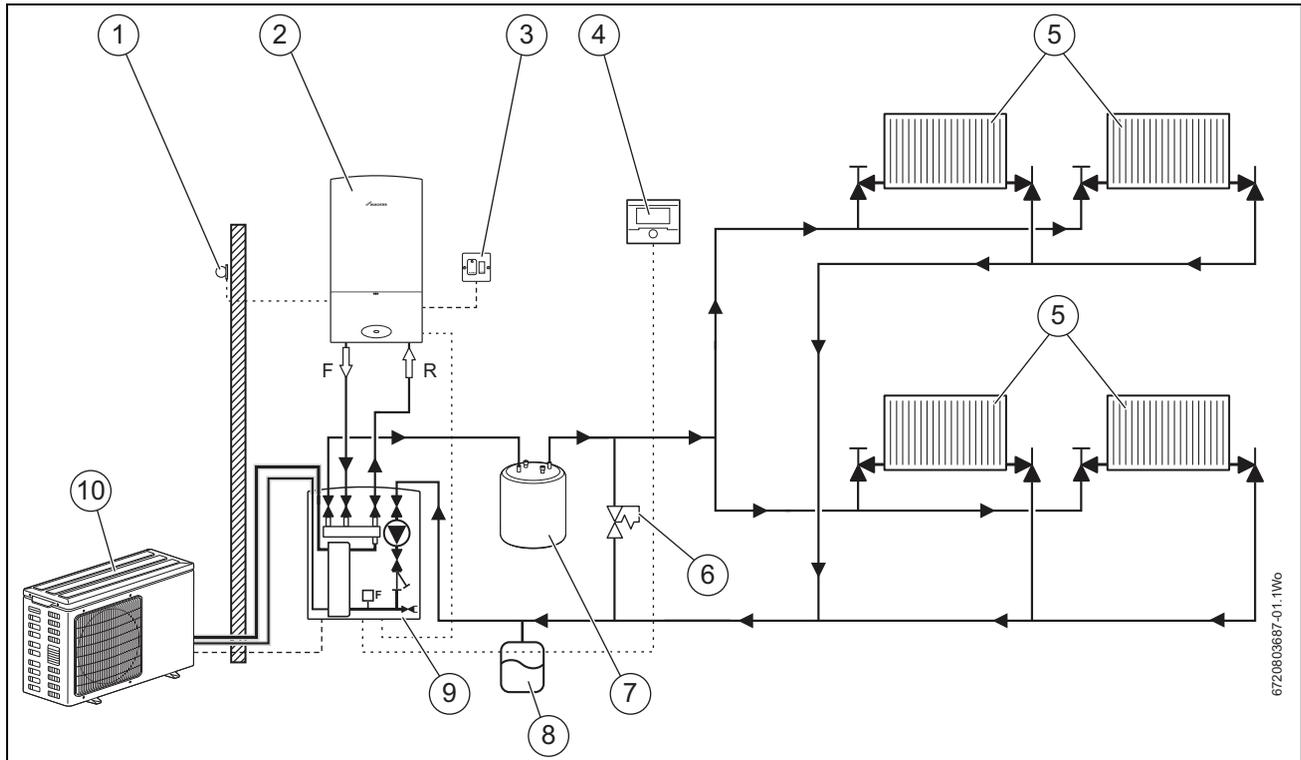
System scheme with serial buffer tank, bypass valve and one unmixed heating circuit
